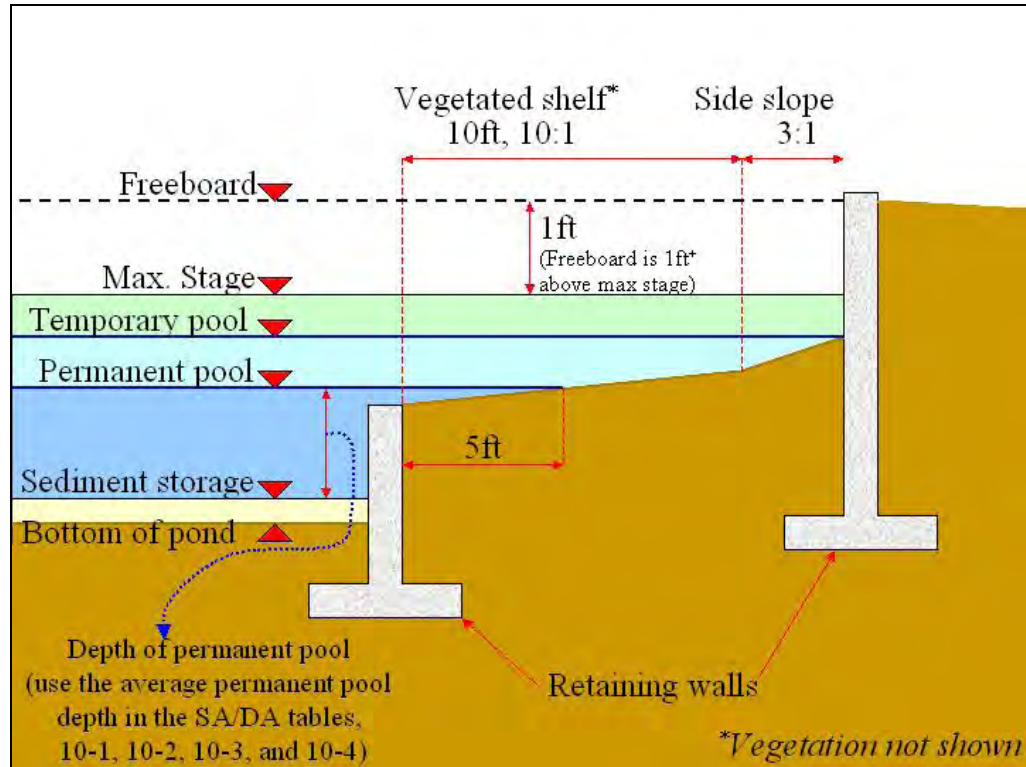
Alternative Wet Pond Design: Retaining Wall Option
